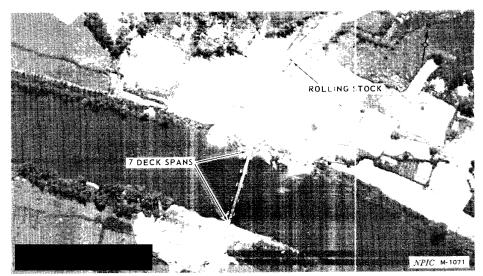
LANG LAU RR BY-PASS BRIDGE OVER SONG CAU, K. F. THAI NGUYEN RAIL LINE, NORTH VIETNAM
